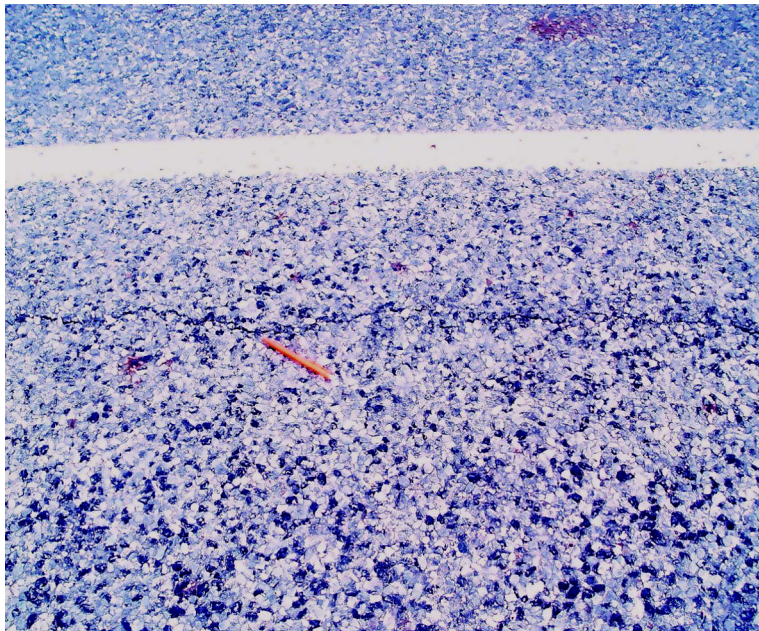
Longitudinal pavement crack (Taken on November'07)
